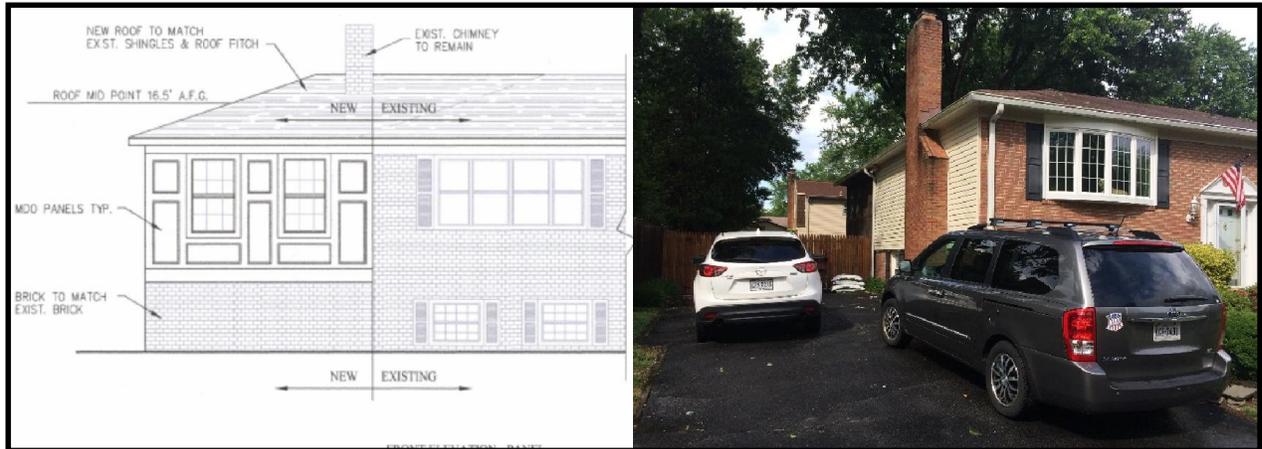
Front view of proposed addition with existing view on right. Source: Applicant.
